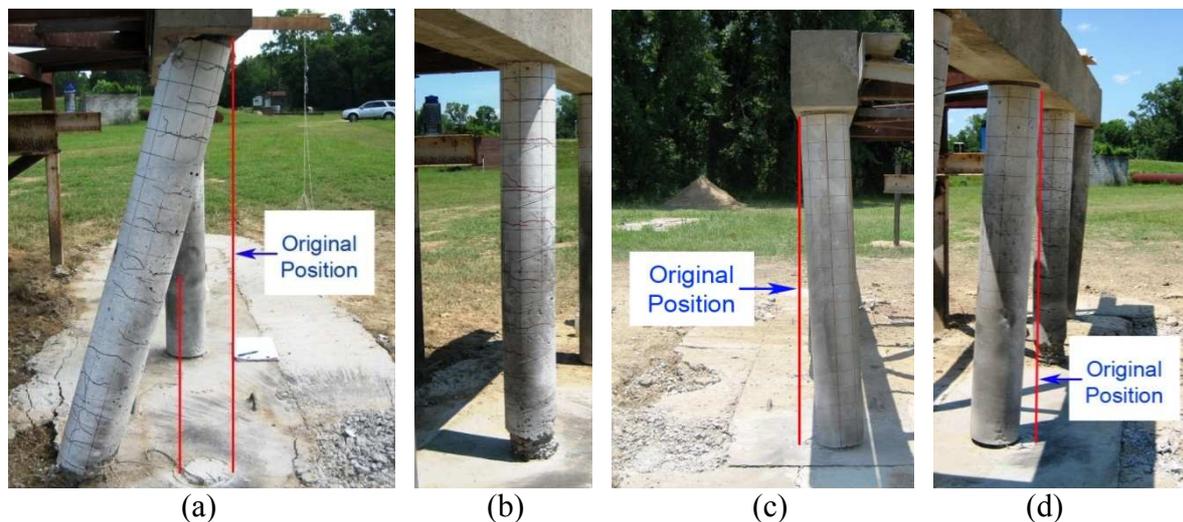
Columns after tests: (a) side view of Column RC1, Test 1 (b) front view of Column RC2, Test 2 (c) side view of Column SJ2, Test 3 (d) side view of Column SJ1, Test 4
